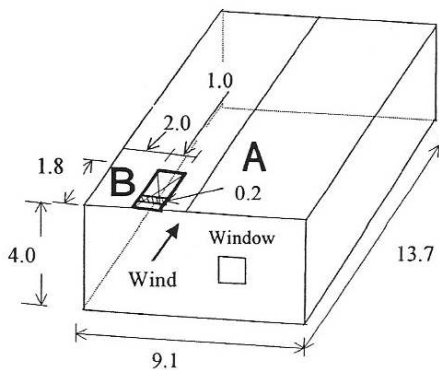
13.7 × 9.1 × 4.0 m full-scale Texas Tech building showing cladding-fastener tributary area A (1.0 × 0.2 m²) and batten-truss tributary area B (1.0 × 1.8 m²)
